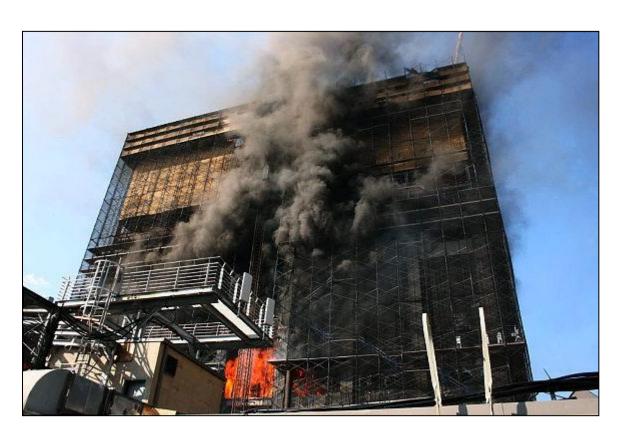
Fire conditions on C-side. (Photo courtesy of fire department.)
